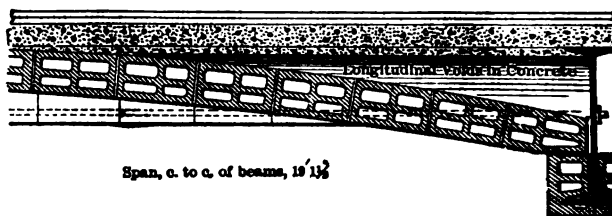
Segmental Tile Floor-arch. Deep Beam. Dropped Skew
